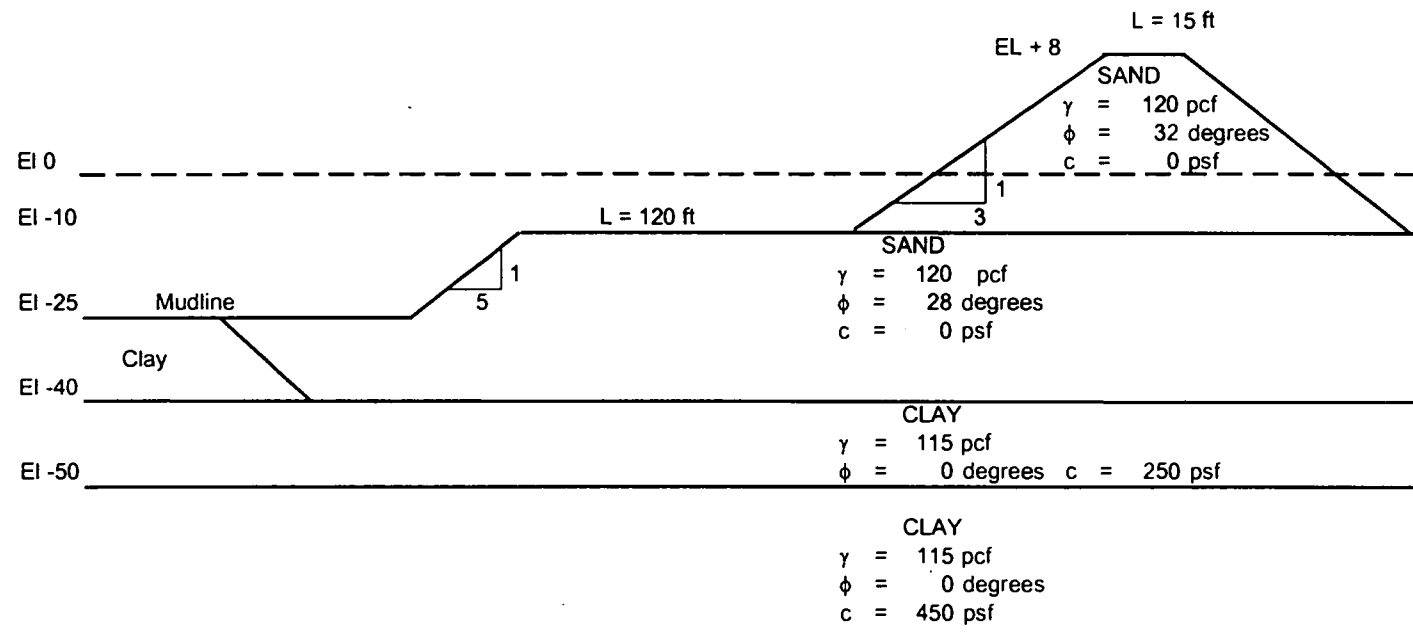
Recommended Dike Section Site 3 - EI. +8
